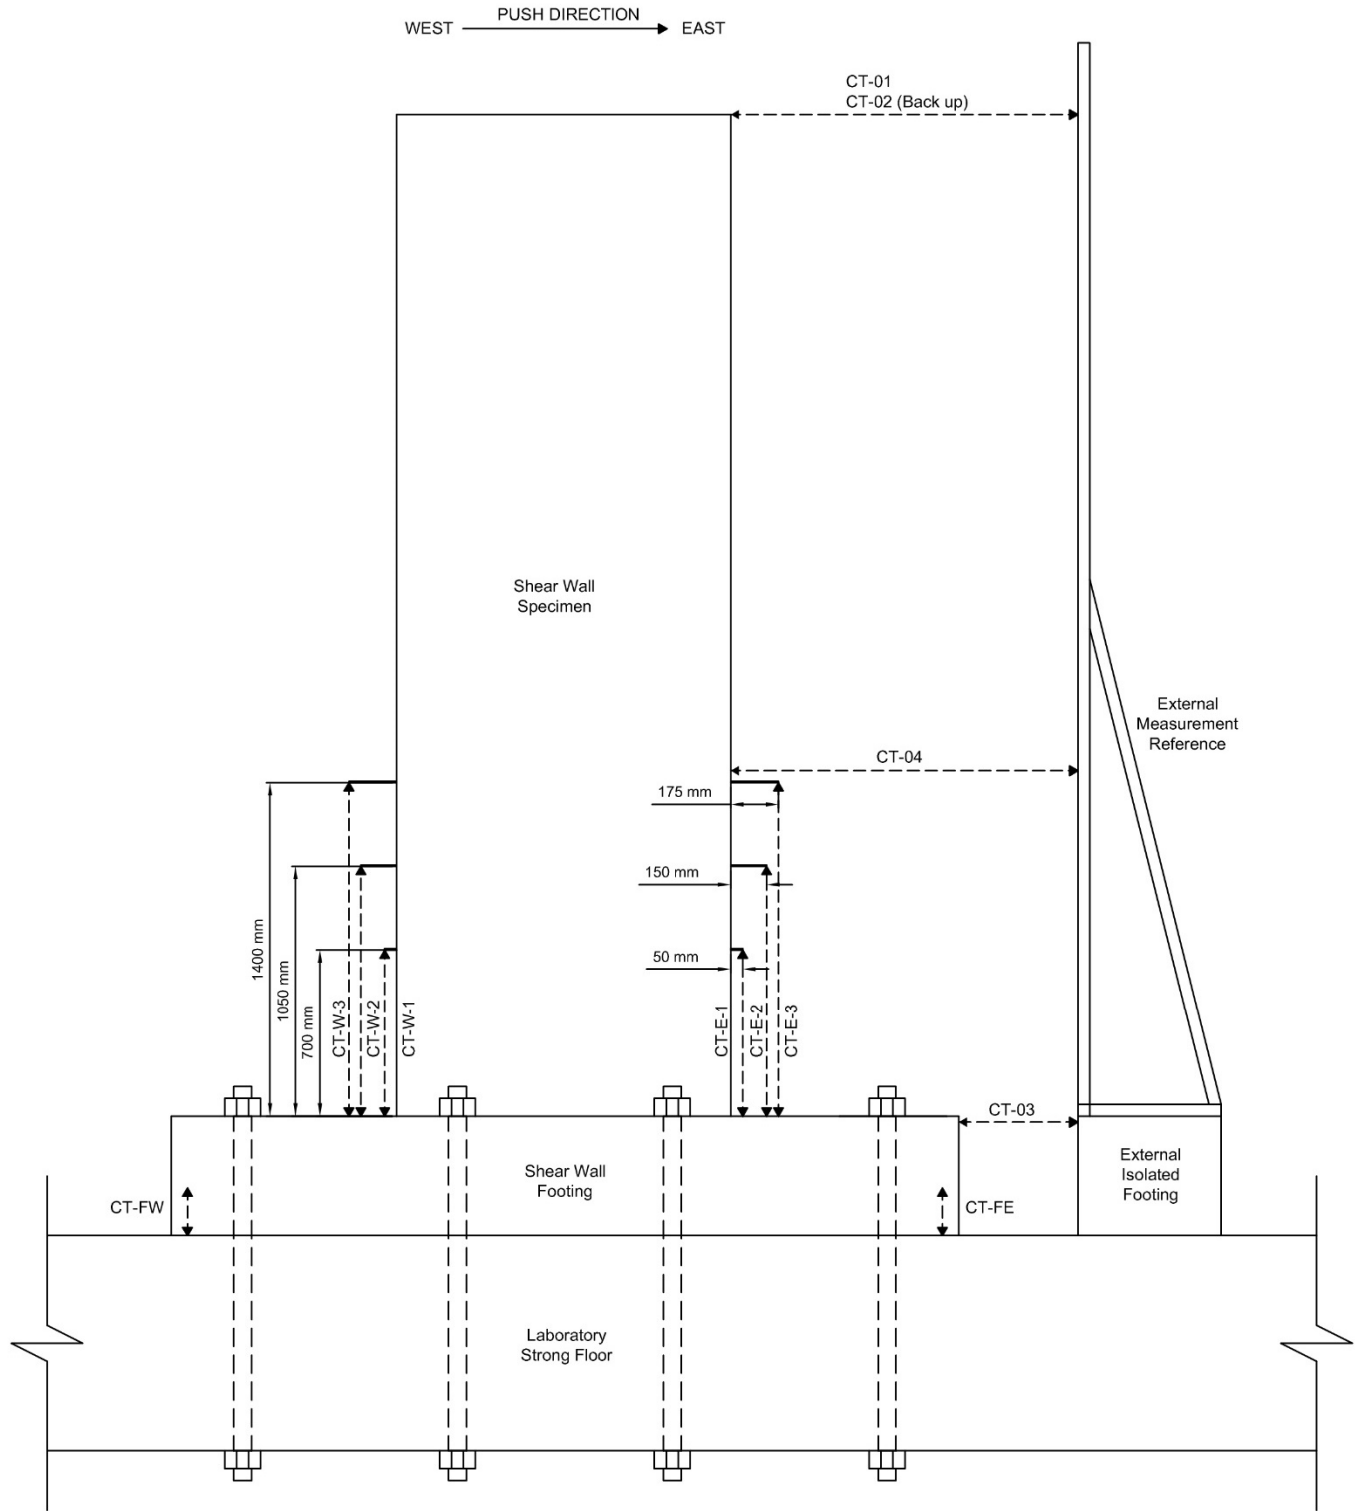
Shear Wall No. 3 – Cable Transducer Layout
